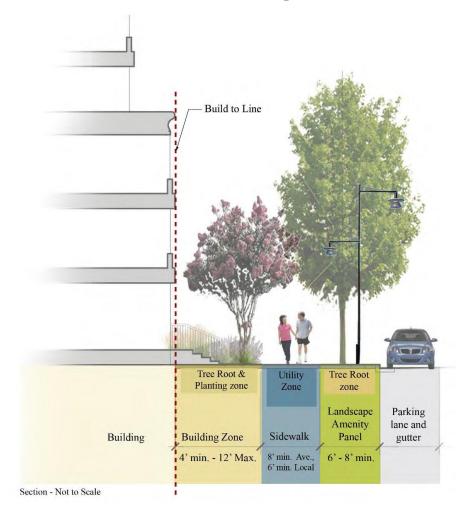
Avenue/Collector/Local Street Streetscape with Residential Building, Section
